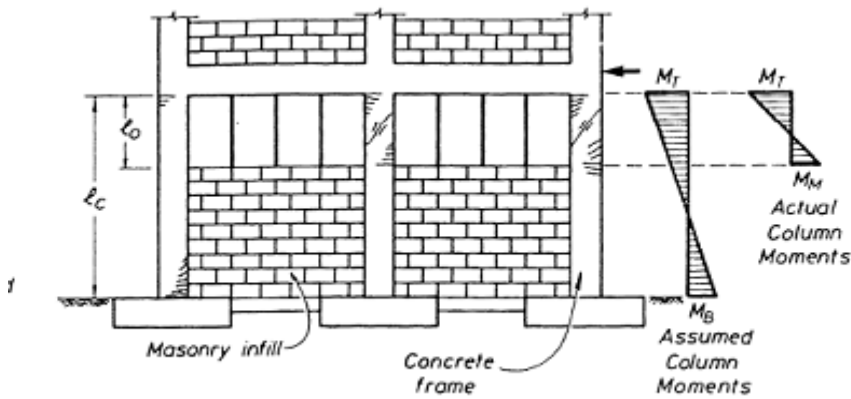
Partial masonry infill in concrete frame [Pauley and Priestley]¹
